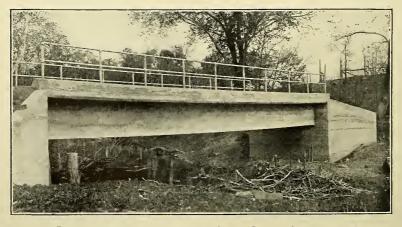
Built in Minnesota. 60-ft. Clear Span. 60-in. Girders with 10-in. slab. Wheel guards 12-in., with galvanized gas pipe rail (wheel guard reinforced).
